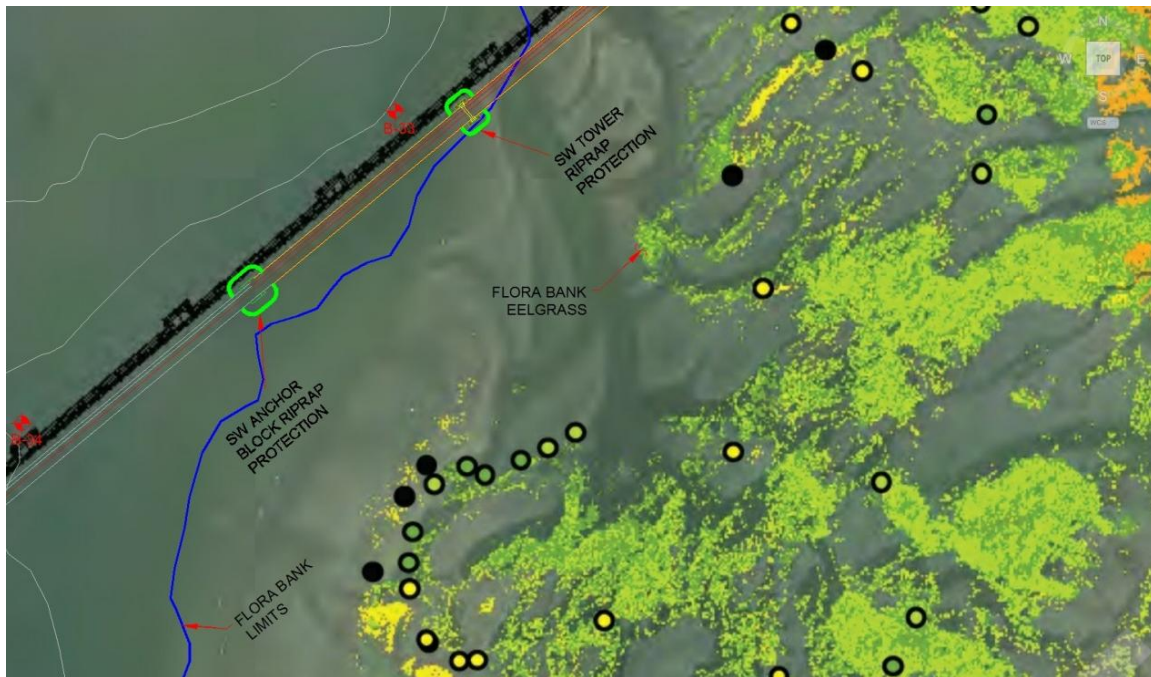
Bridge Structures Scour Countermeasures on Flora Bank [55]
